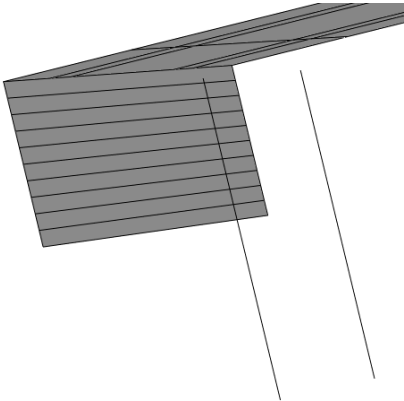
The location of the upper part of the outer columns of the semi-integrated abutment bridge are located below the surface of the bridge slab.
